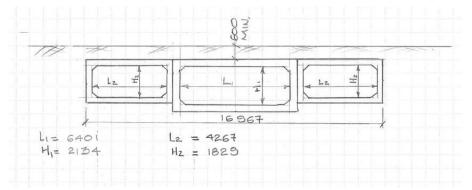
Conceptual Cross-Section for Structural Alternative 2A - North Structure
